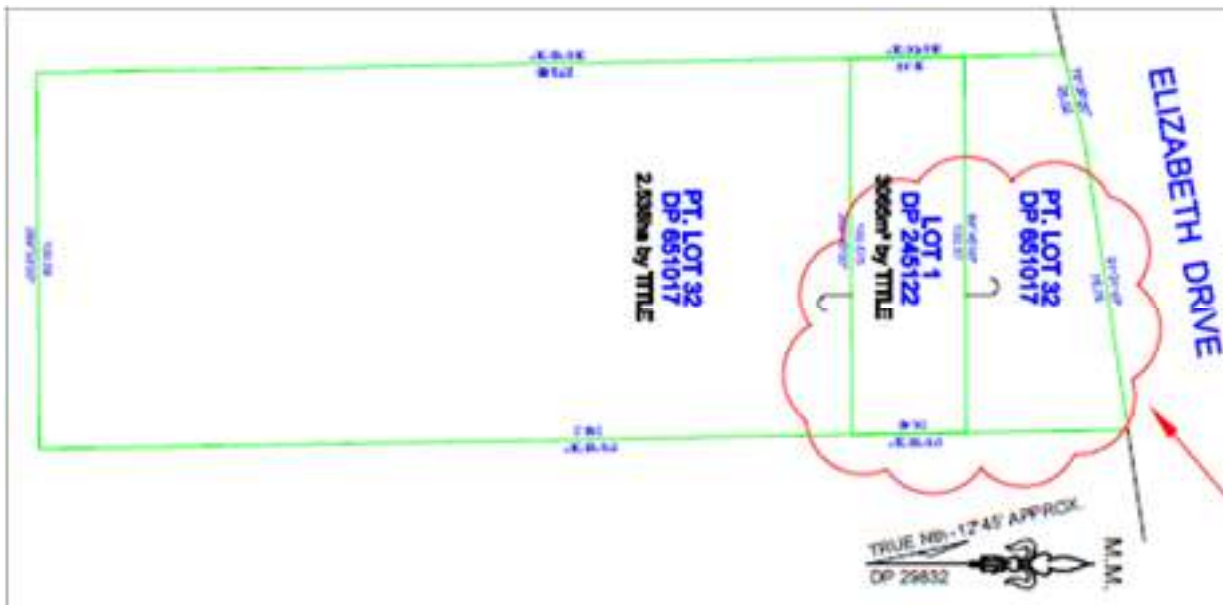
Survey Plan for 1562 Elizabeth Drive, Cecil Park
